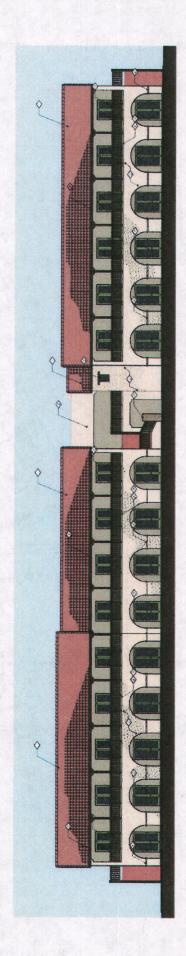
, Plot Plan No. 16891R3, Hotel Expansion Elevations
